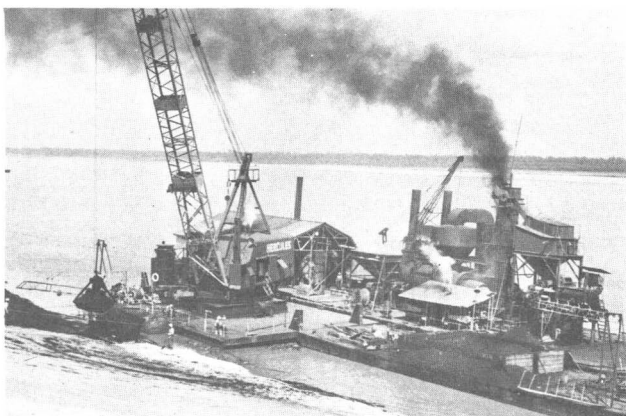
Asphalt Mix Plant, Upper Bank Paving, Mississippi River
